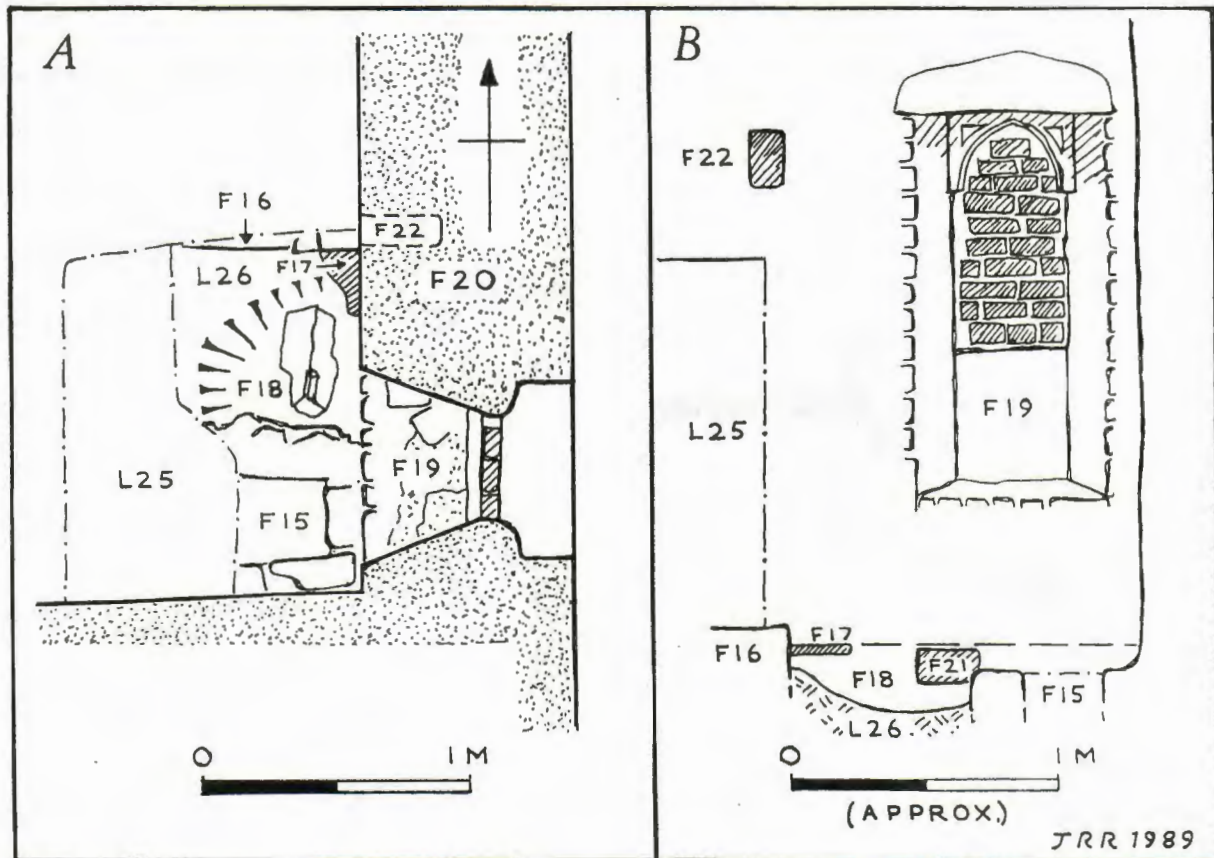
A: Area 2 Plan; B: Area 2 sketch elevation of east wall of almshouse
